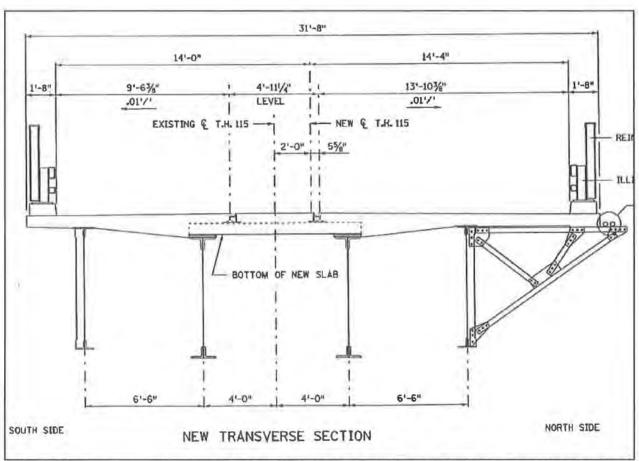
Transverse section of Bridge No. 4969 as carried out in 1998 rehabilitation plan
